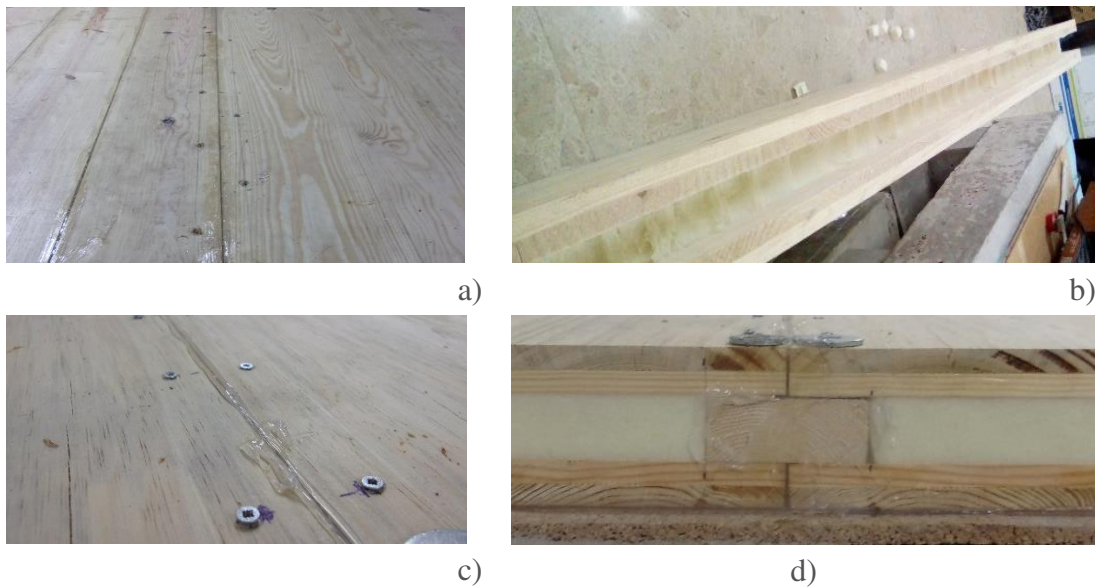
Details of the connections used to assemble the panels: a) Crossed-screws in the CLT 70, 170 and CIT 170 panels; b), c) and d) Spline in the CIT 70 panels.
